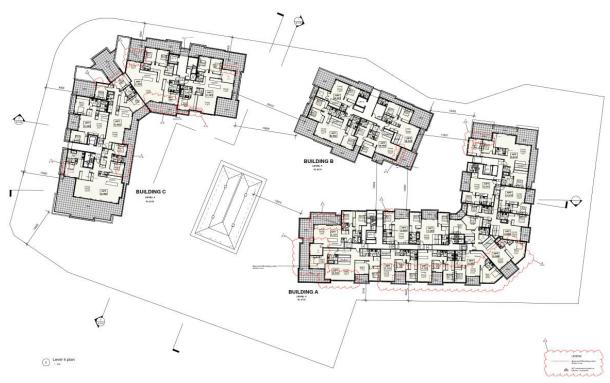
Pacific Lodge & Level 4 Floor Plan (Dwg No. A 2.06)
